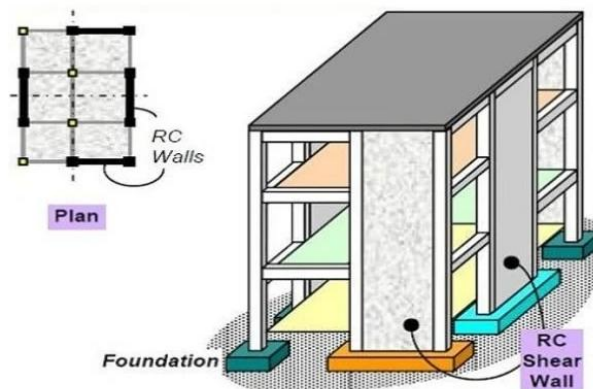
Shear wall system (Courtesy: C. V. R. Murthy)
